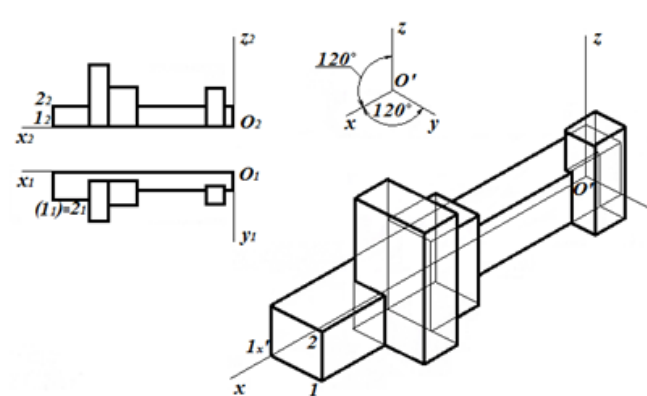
Construction of axonometric images of a group of schematic buildings
